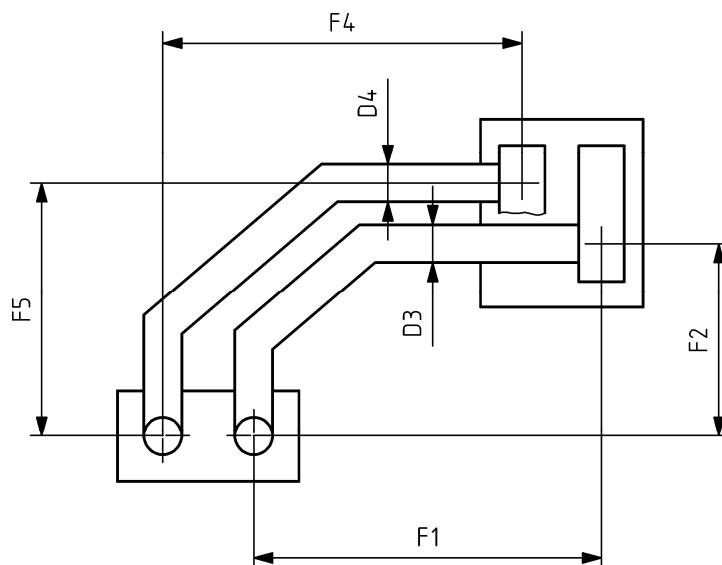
is an example of a gas appliance type C<sub>3</sub> and a type C<sub>4</sub> installation, and Figure 4 is an example for connecting flue pipe and connecting air supply pipe dimensions for a C<sub>4</sub> application with separate ducts.
